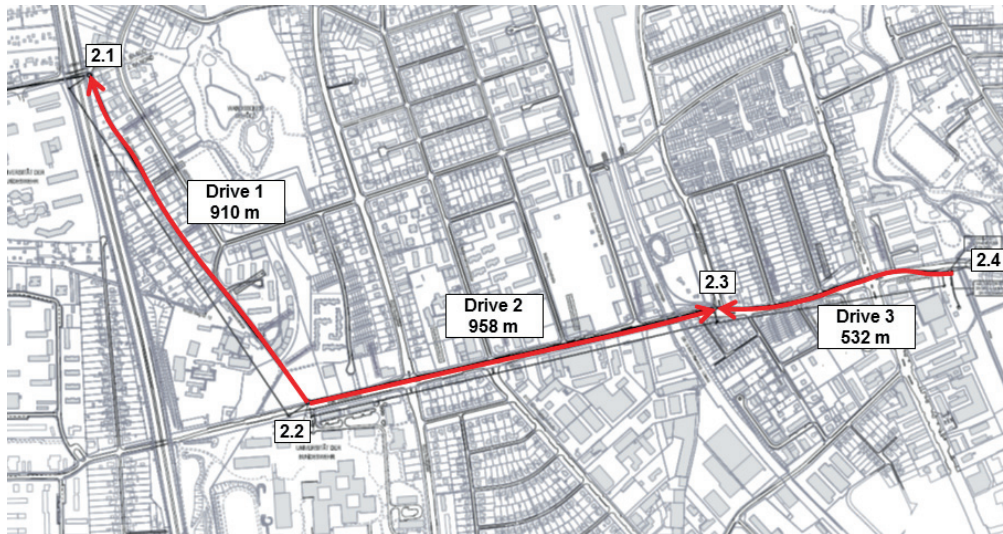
Project overview of the three pipe jacking drives. (Layout plan by Hamburg Wasser with additions by Tim E. E. Becker)
